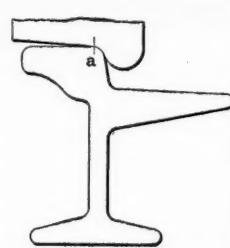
Bearing of Beveled Wheel Tread on Flat Rail Head.
